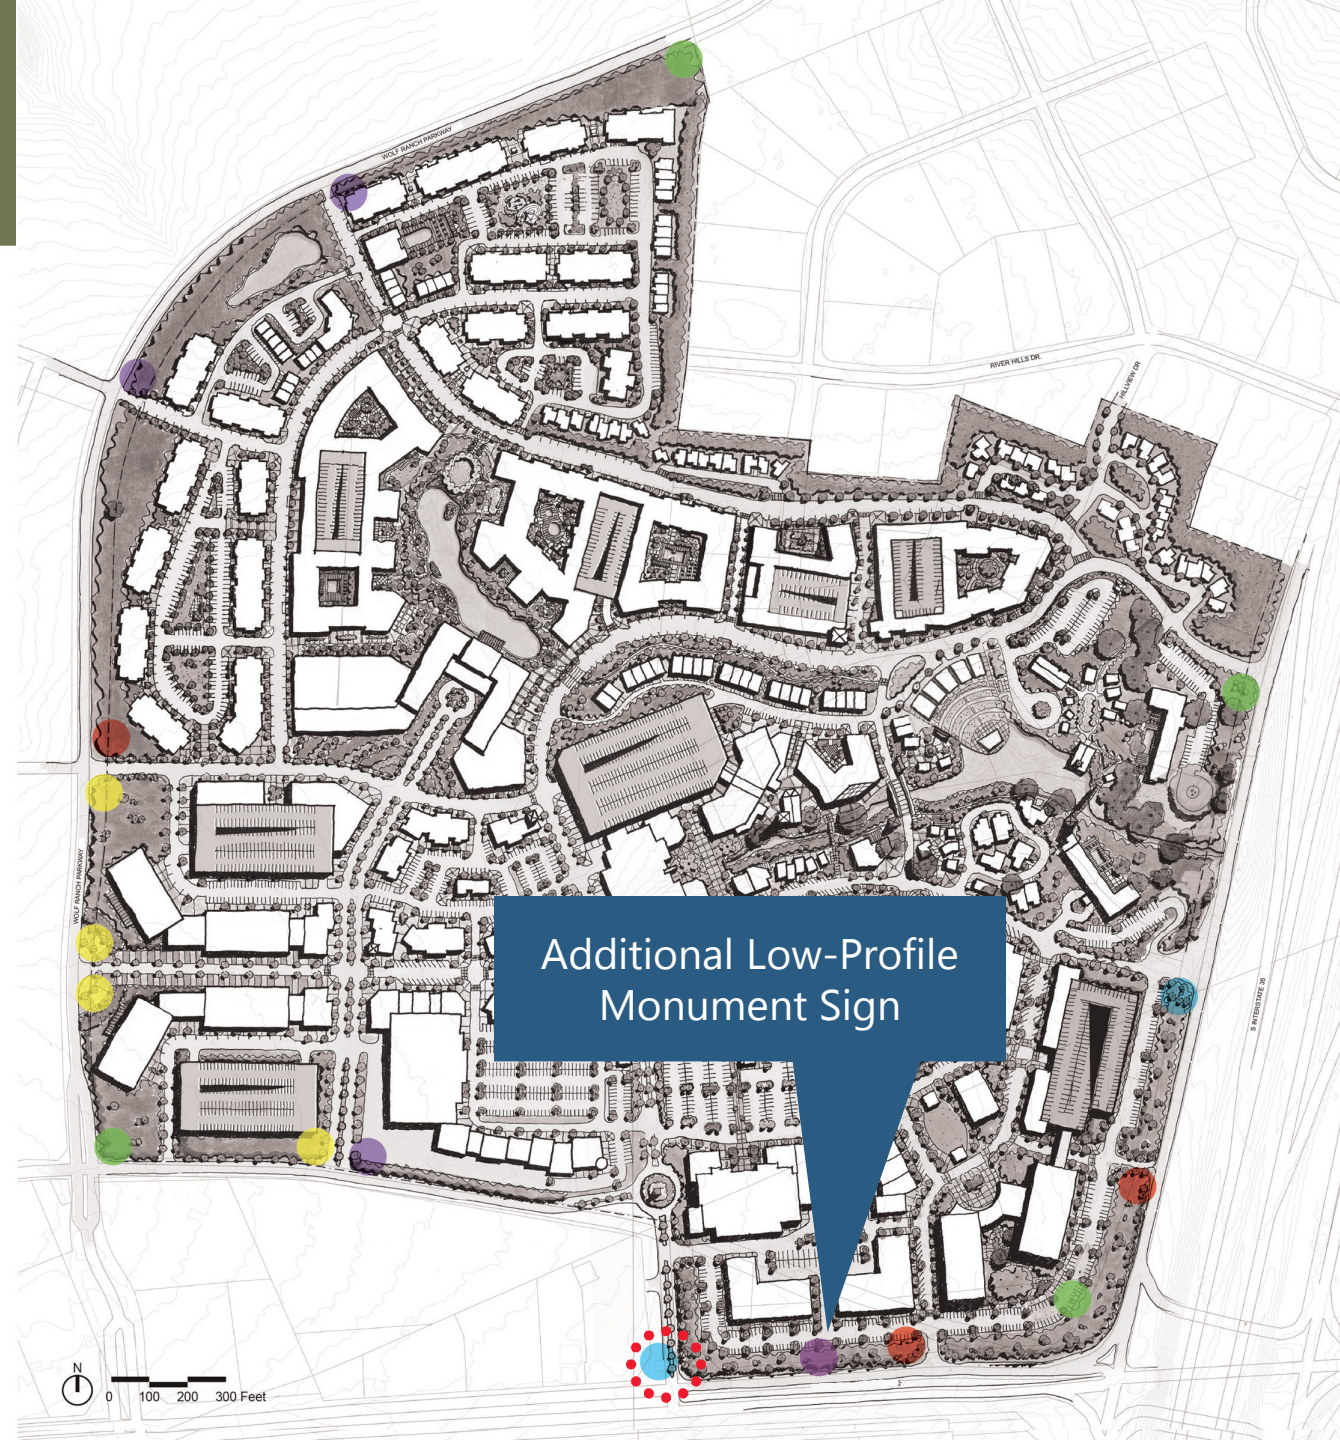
PERIMETER SIGNAGE PLAN
